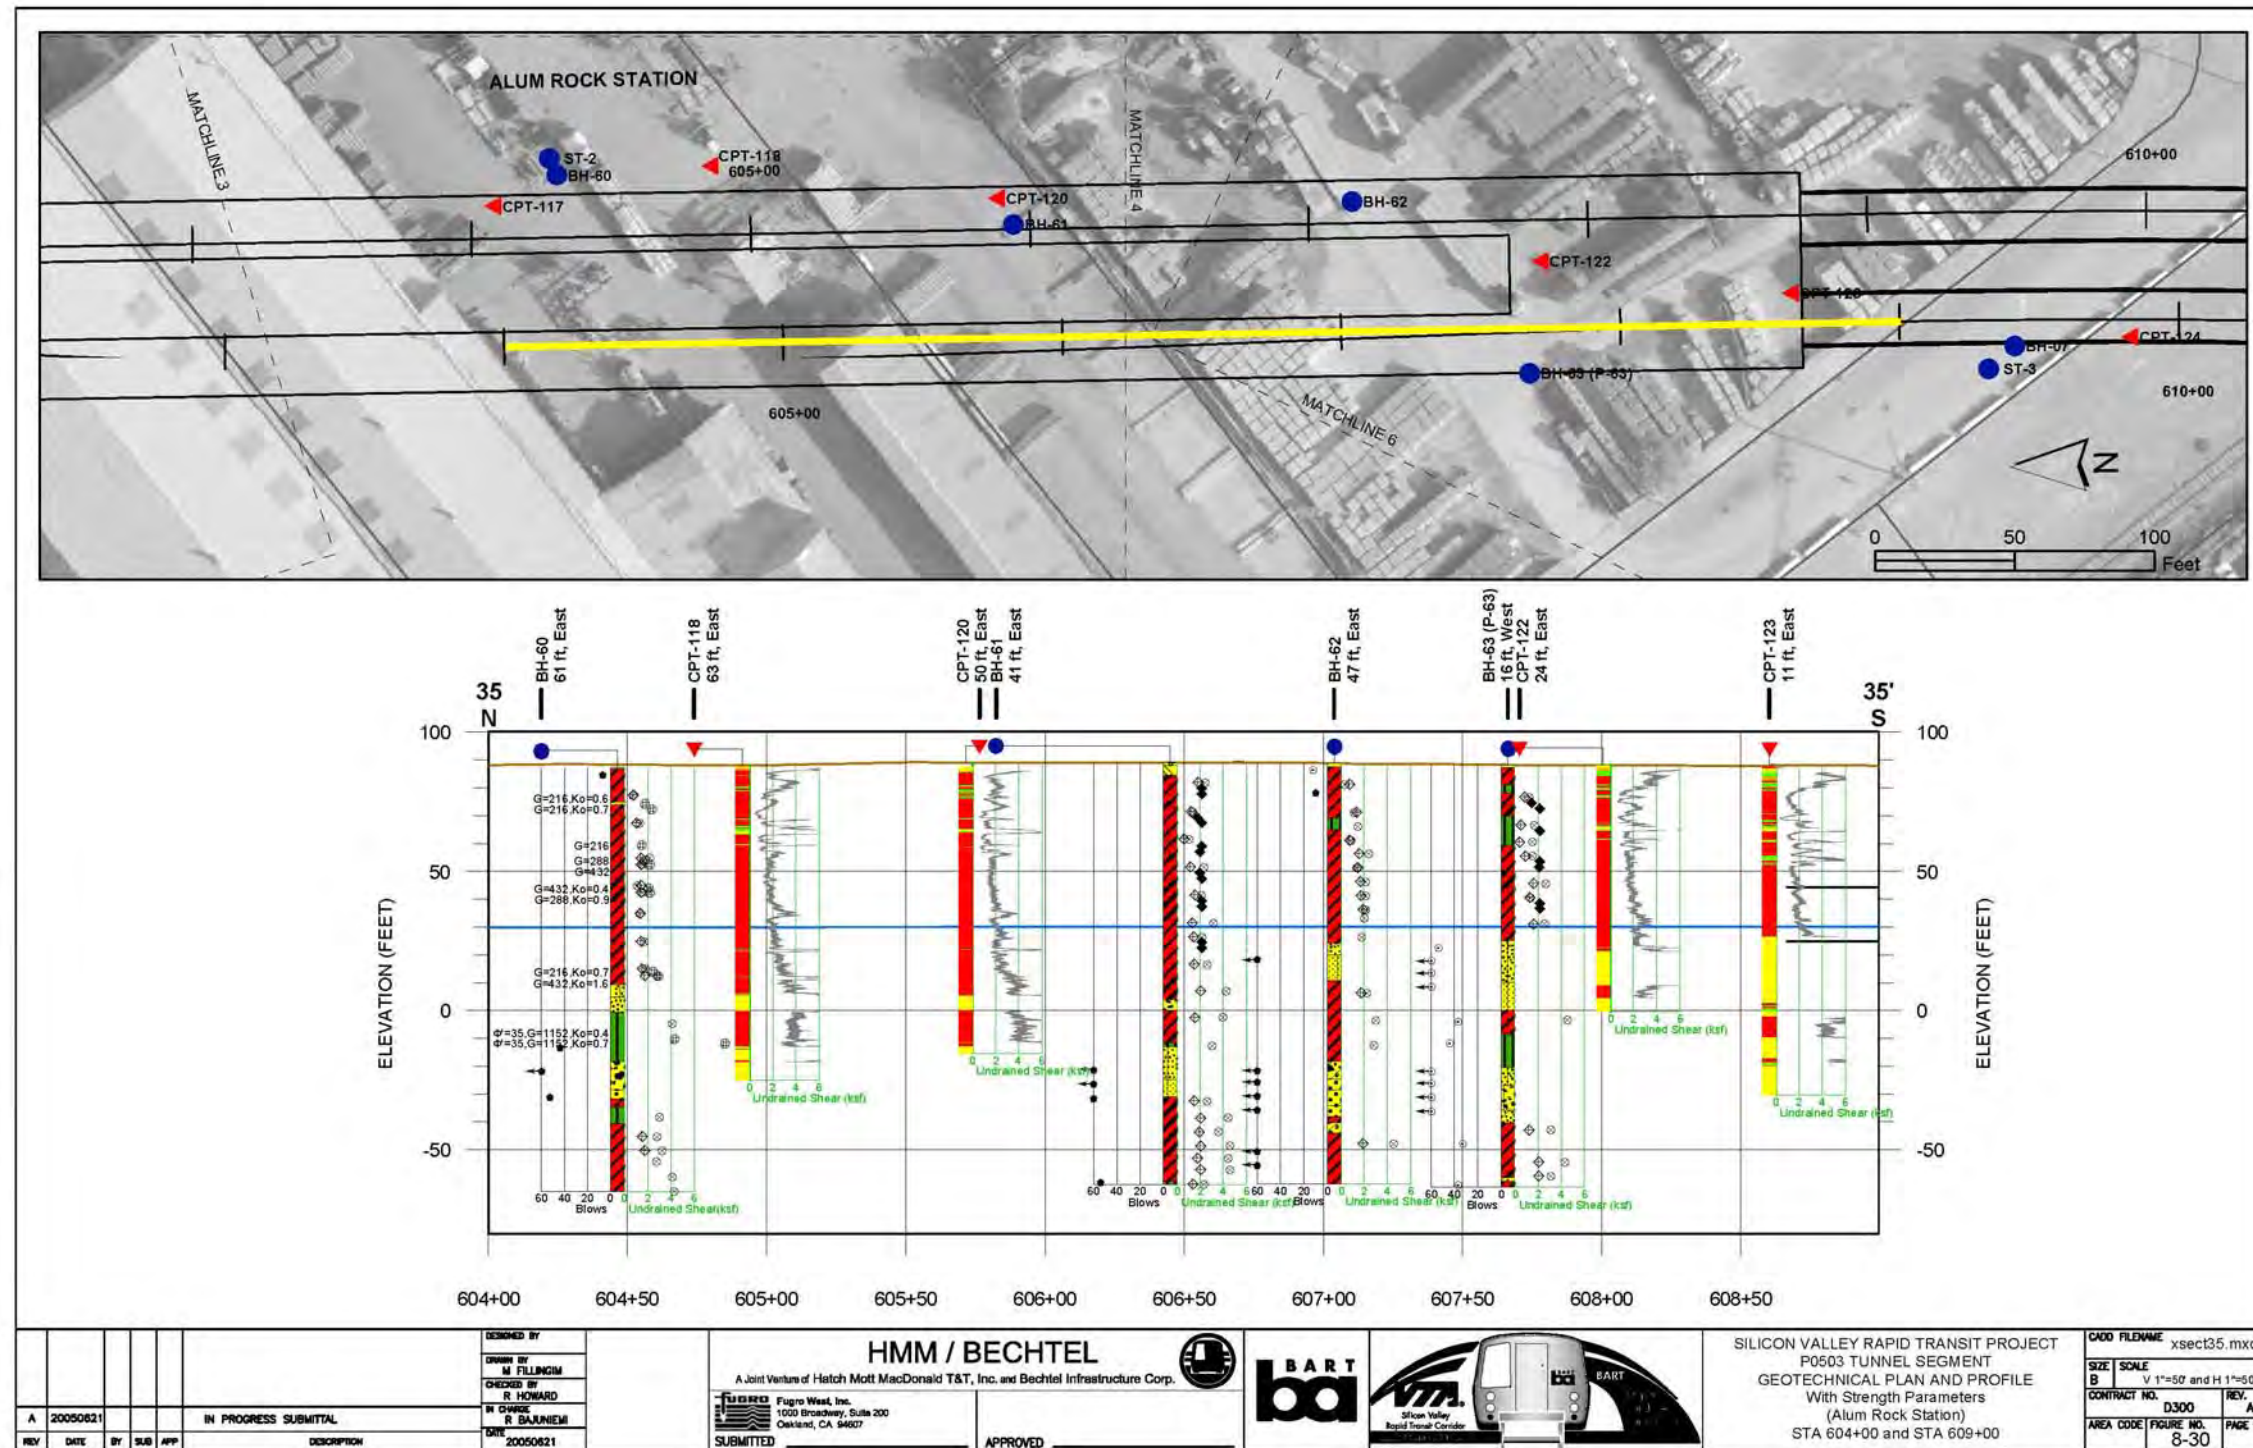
Geotechnical Plan and Profile with Strength Parameters: 604+00 to 609+00.
